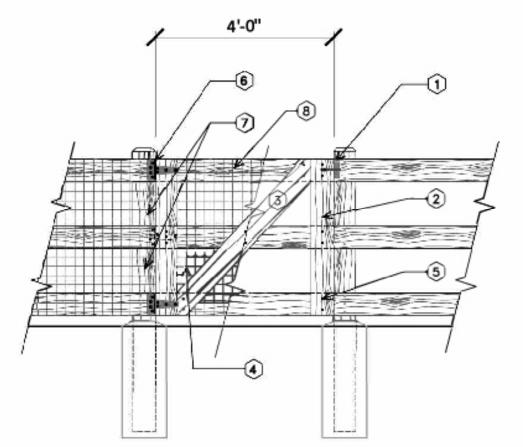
Cedar Rail Fence INSIDE See Section 5.0 for Details THE LAKES ENTERRA
